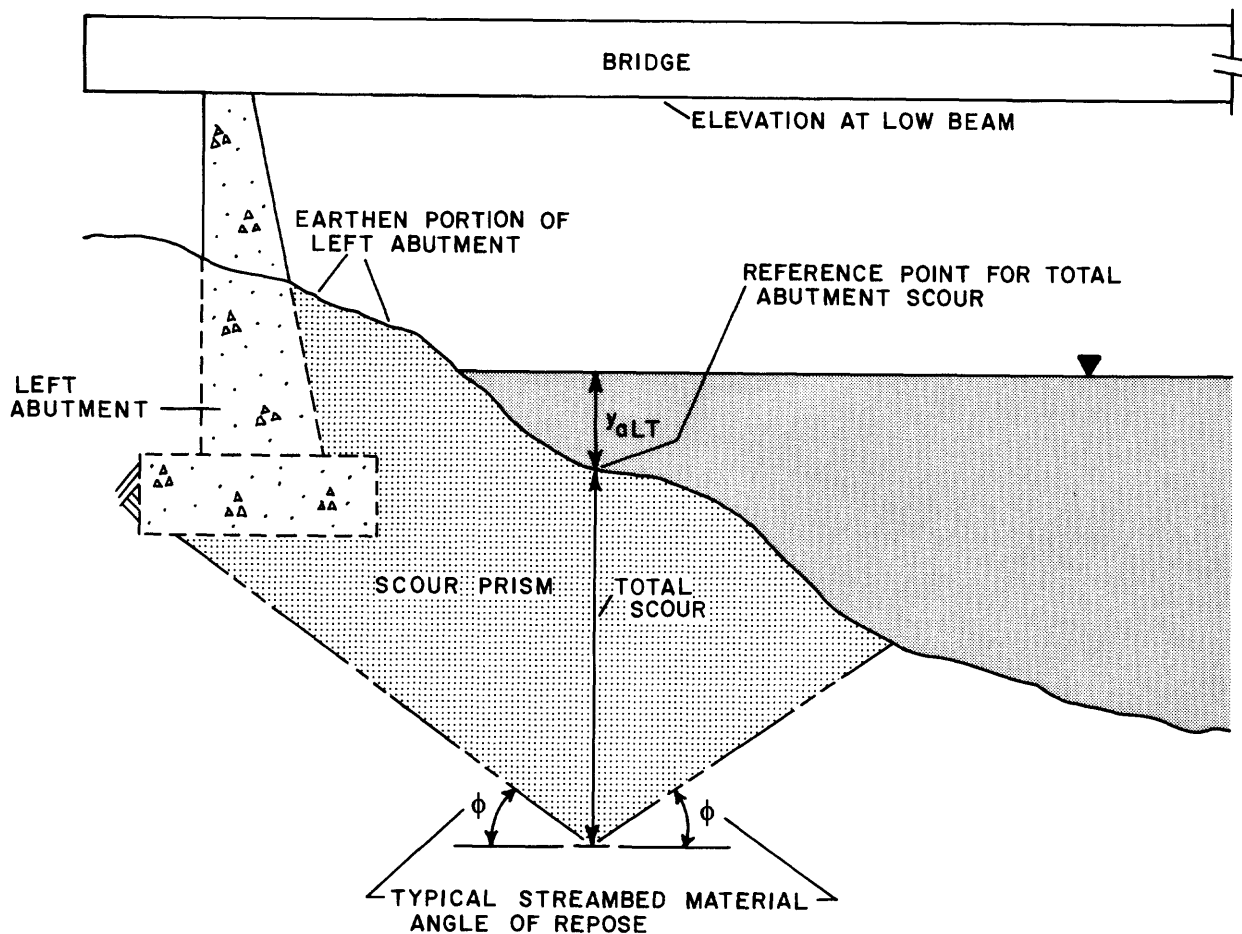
Abutment scour where visible portions of concrete abutments are outside of flood limits.
